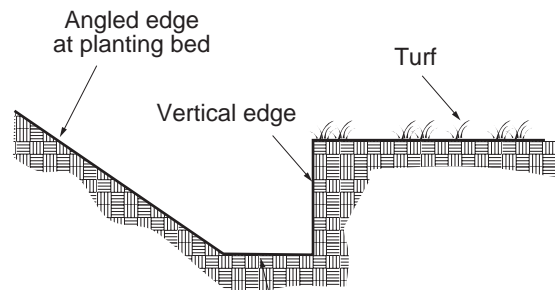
Proper trench for edging showing vertical excavation on lawn side.
